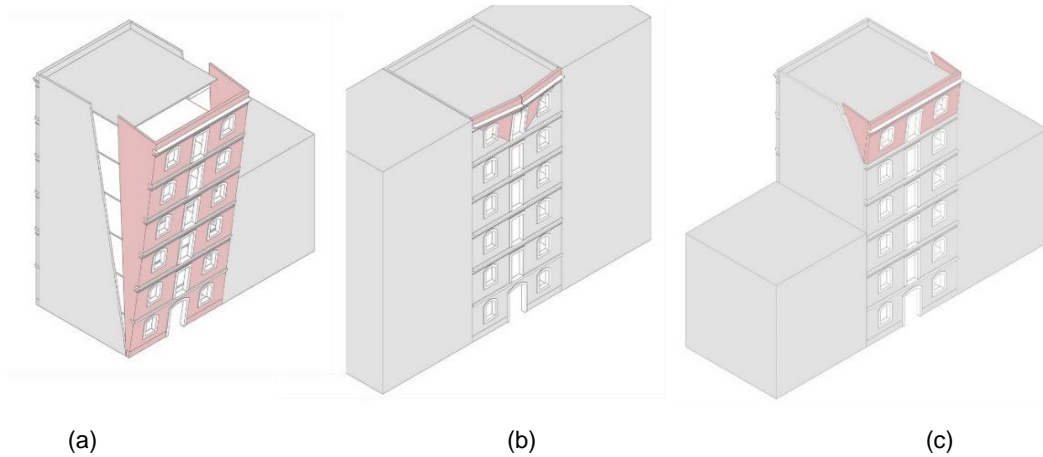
Local mechanisms: (a) Overturning of the main facade with two side wings, (b) Overturning of the top story (horizontal arch-top strip), (c) Overturning of the last floor with two side wings
